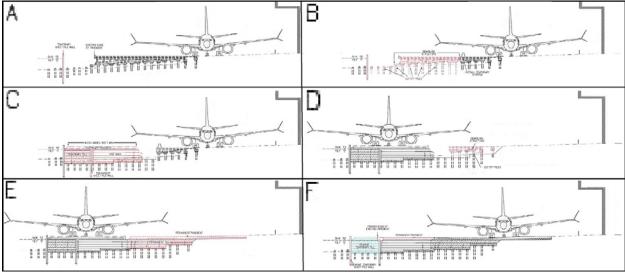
Profile drawings of the pile-supported section of the West Apron, showing the phased reconstruction the apron, including construction of the temporary towpath bypass (Adapted from Wood 2019a Figures 5a - f).
